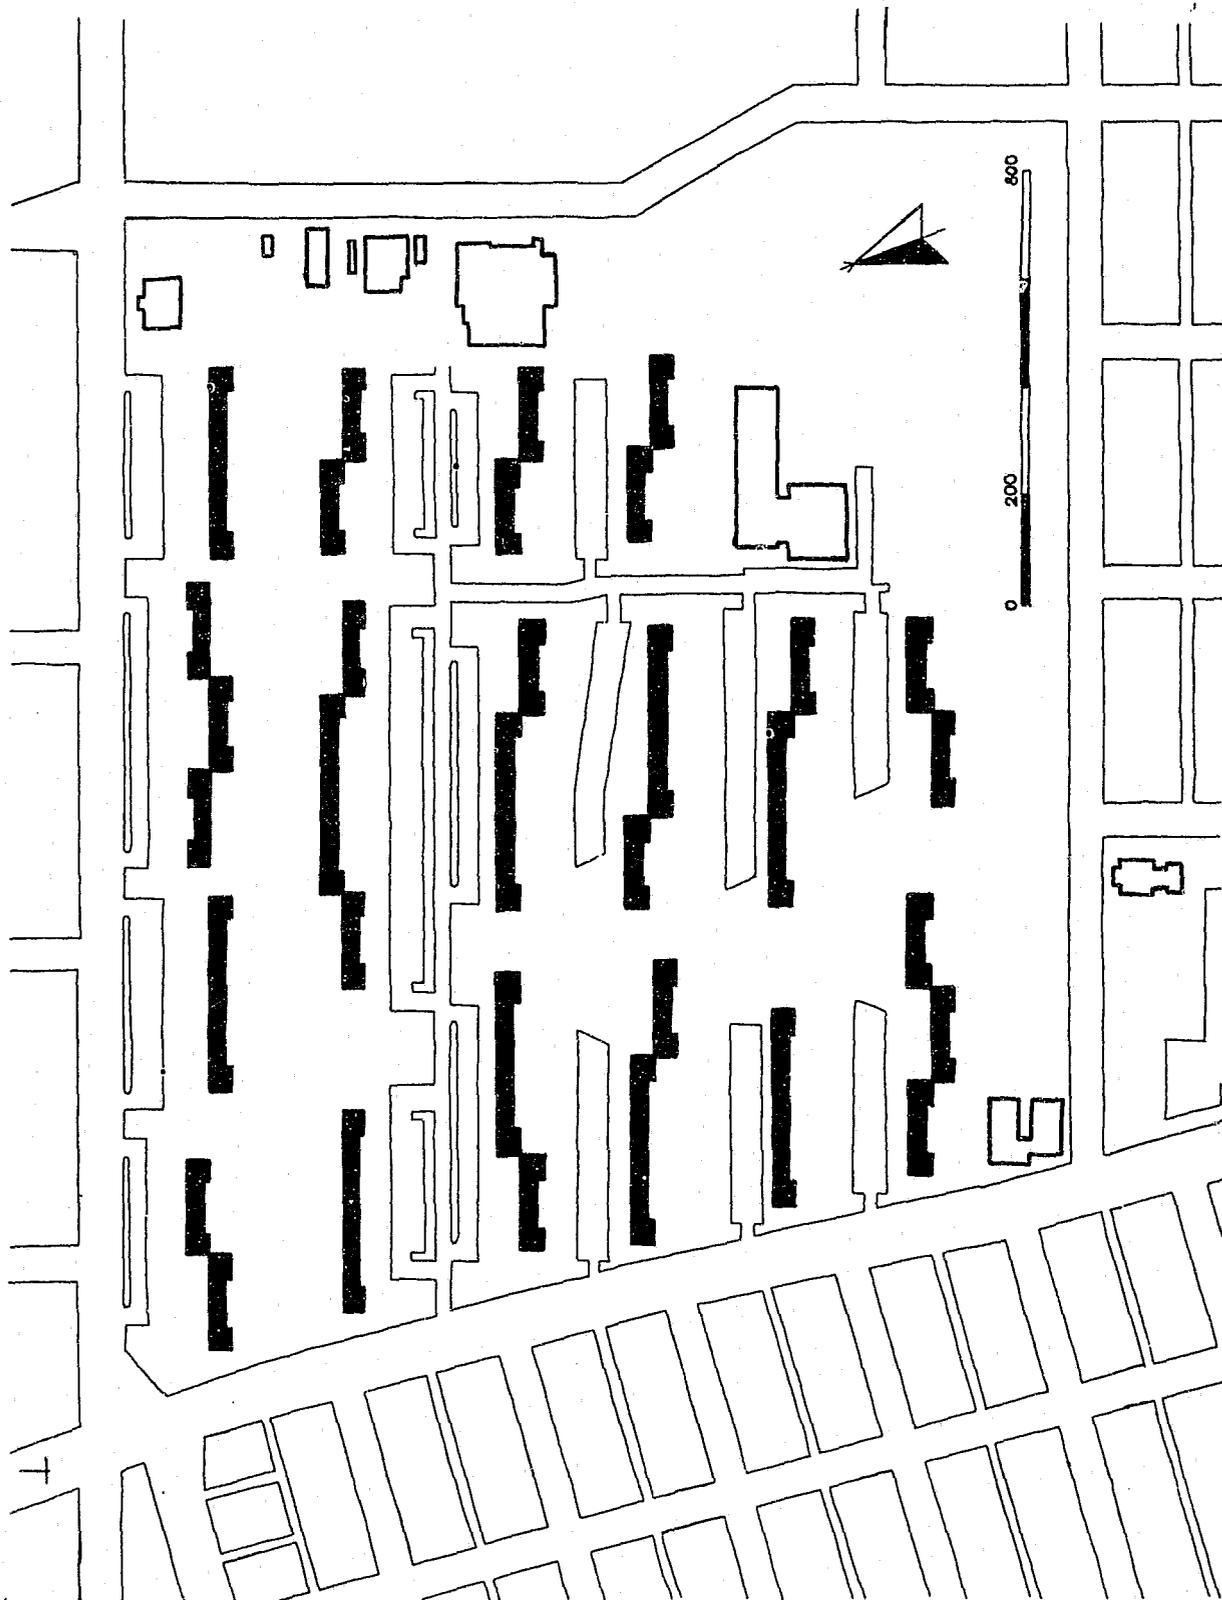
Pruitt-Igoe, St. Louis, Mo. Site plan.
